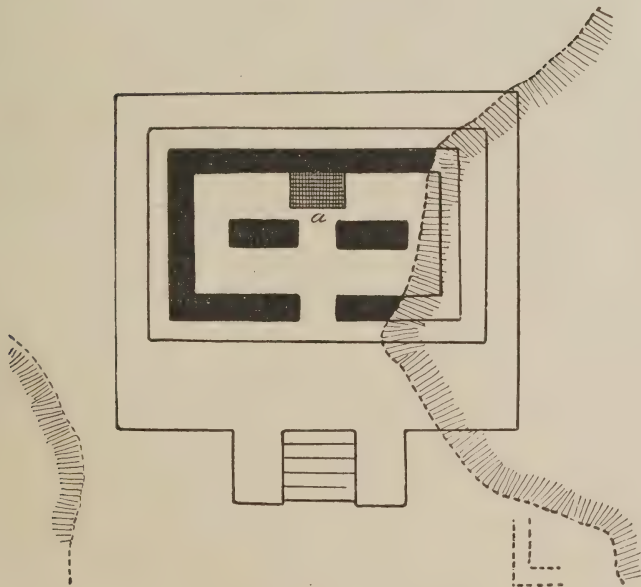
GROUND PLAN OF RUINED TEMPLE AT SOUTH END OF MUGERIS ISLAND.
